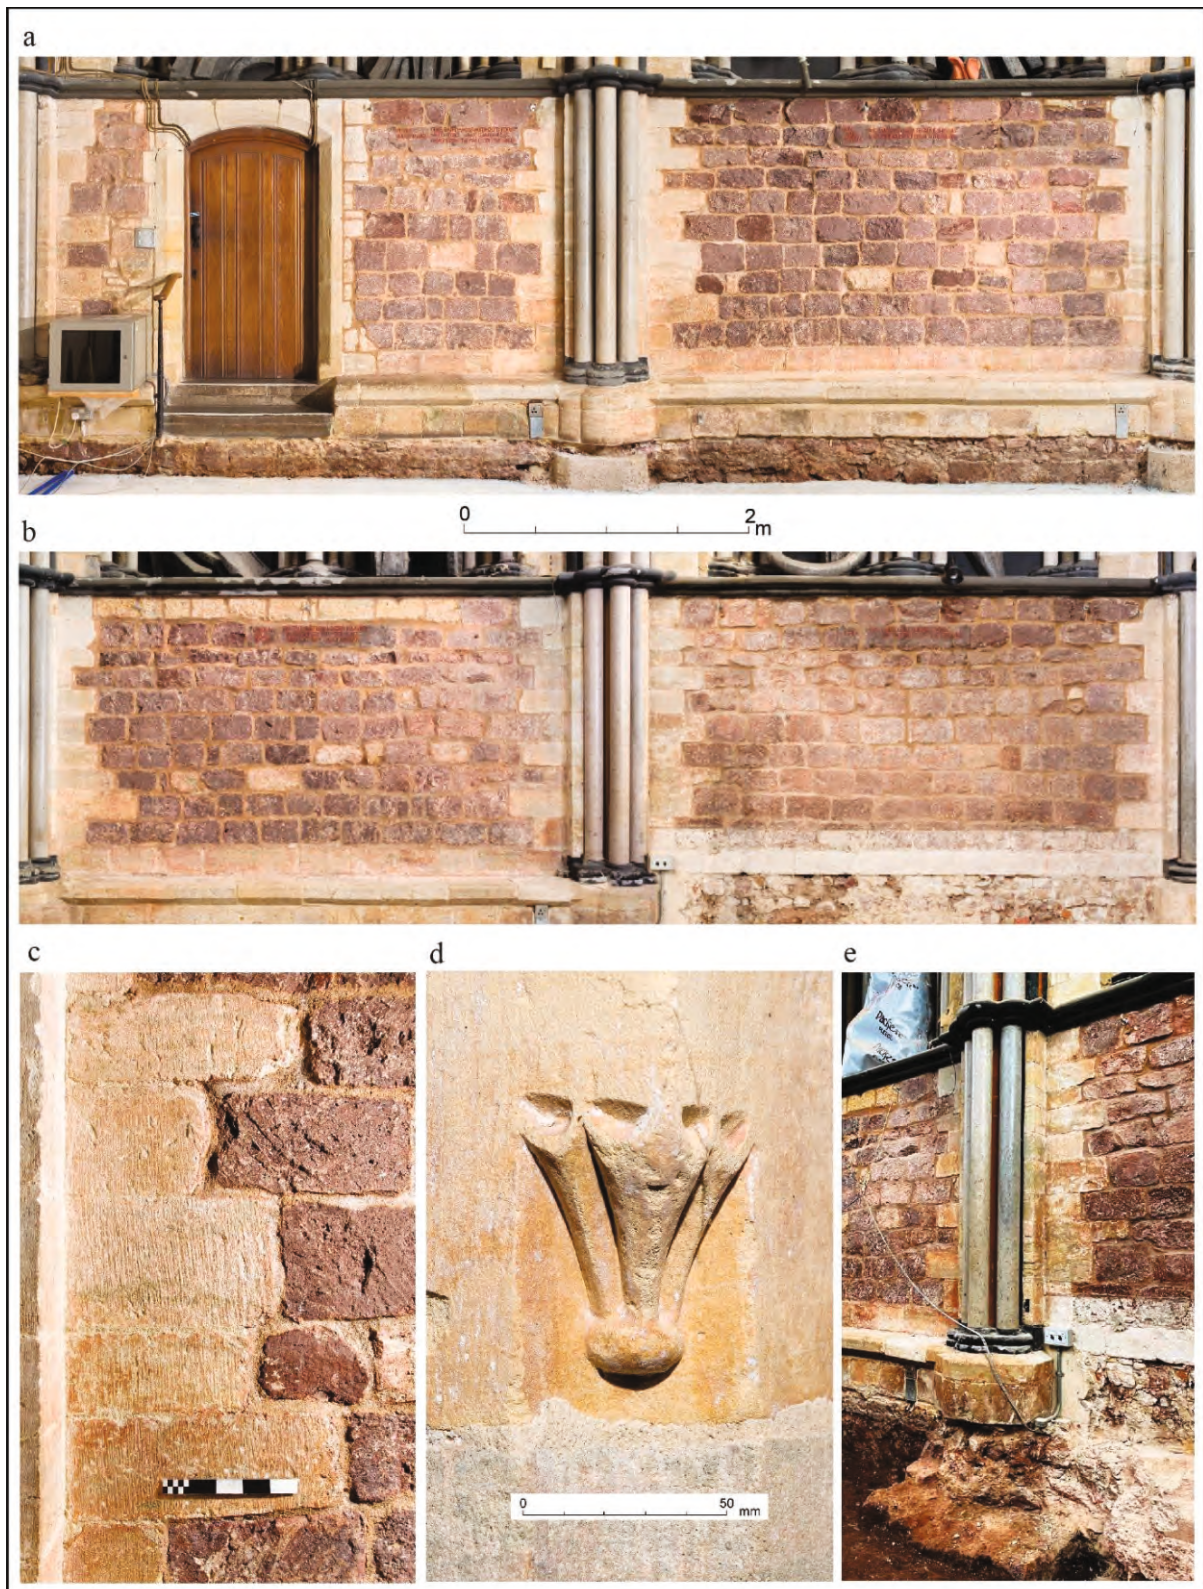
The Chapter House, internal face of the north wall: photographic record prior to replacement of render. (a) Bays 4 (left) and 3. (b) Bays 2 and 1. (c) Chisel-dressed Salcombe stone ashlar with ?pick-dressed volcanic stone wallstones. (d) Moulding stop, pier between Bays 1 and 2. (e) North wall, of the pier between Bays 1 and 2, showing later damage to the foundation (photos Gary Young/J. Allan).
